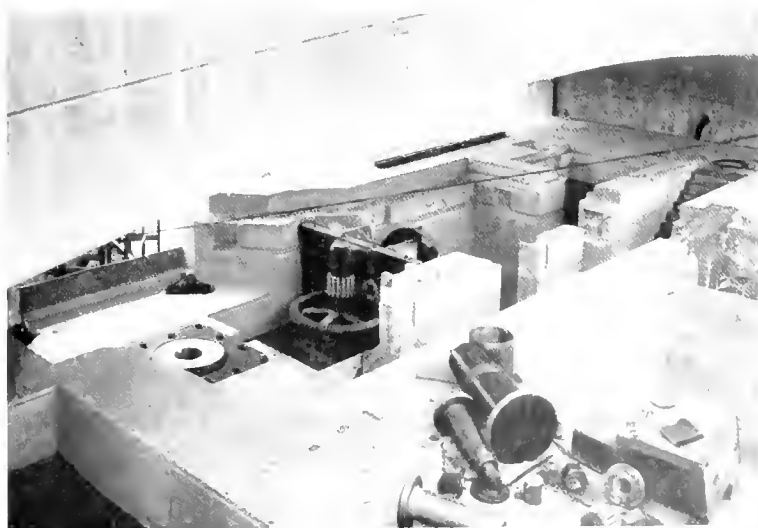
Miraflores Lower Locks. Miter Gate Moving Machine No. 127, showing center pinplate bulkhead, vertical shaft, 72 in. bevel gear and 64 in. spring center gear in place. West wall, south end. May 11, 1913
